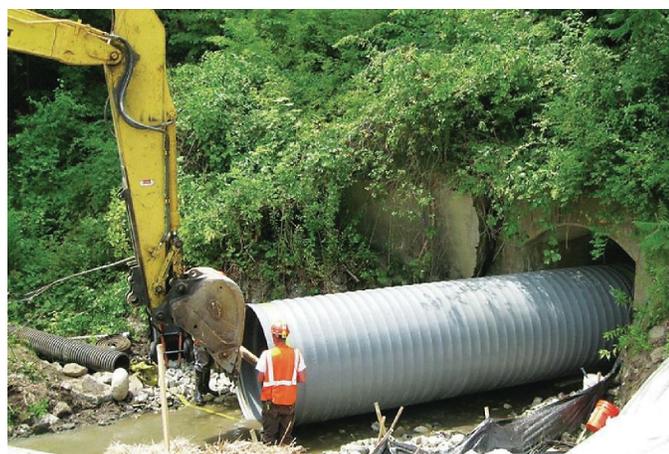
Sliplining a culvert (Courtesy: Advanced Drainage Systems, Inc.).
